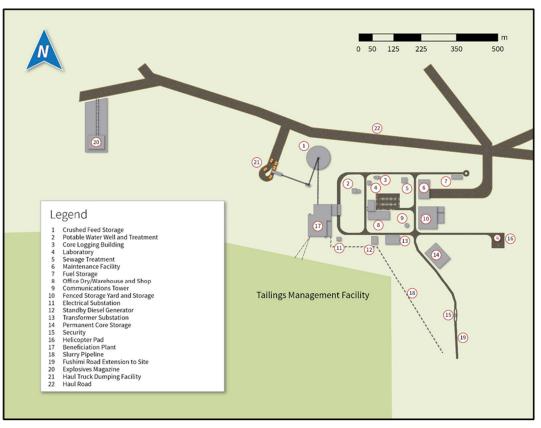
Conceptual Mine Site Infrastructure Layout
